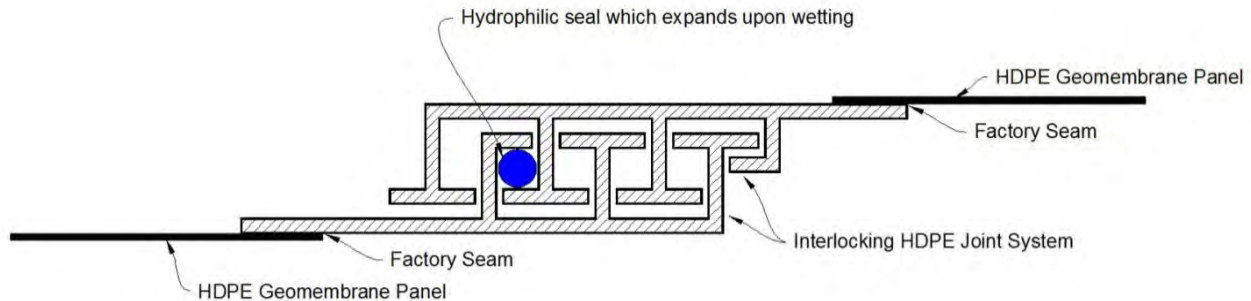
Joint detail showing connection of adjacent vertical geomembrane panels.
